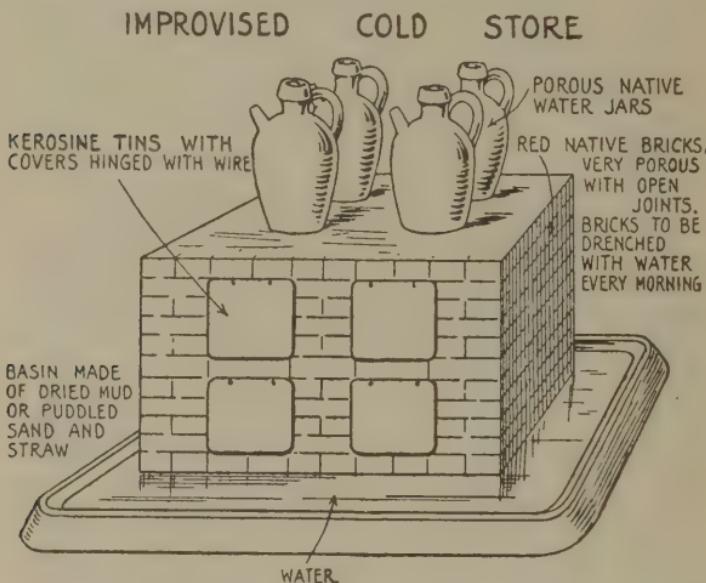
Brick box cooled by evaporation. The interior should be sterilized before use and weekly thereafter. (*After Lelean.*)
